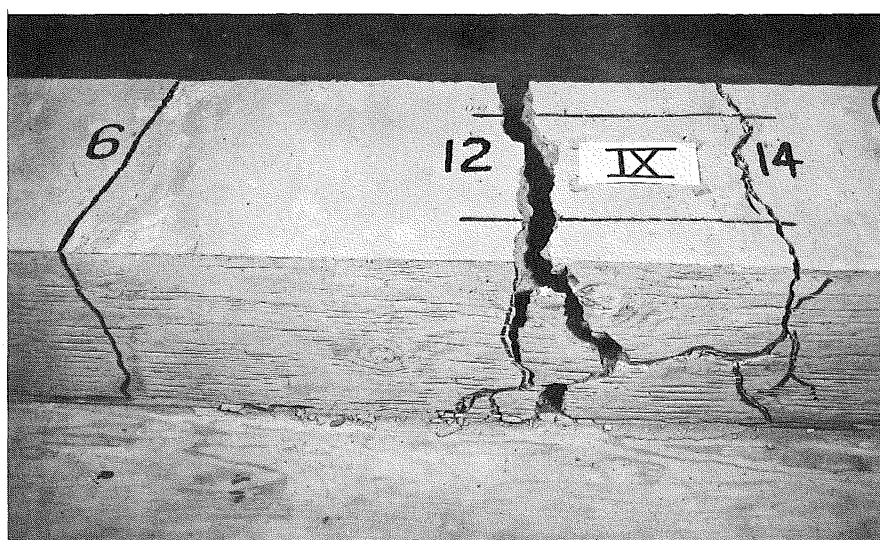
D - FAILURE OF SPECIMEN IX (SET C)
